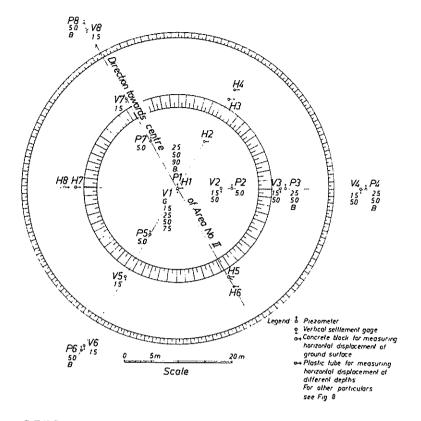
AREA III: GAGE LOCATIONS AND DEPTHS BELOW GROUND SURFACE IN m. FROM HANSBO (1960).
